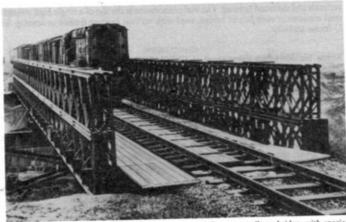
An Acrow Panel Bridge (APB) used as a 140 foot span railway bridge, with special transoms, stringers and swaybrace for the heavy rail loading.
